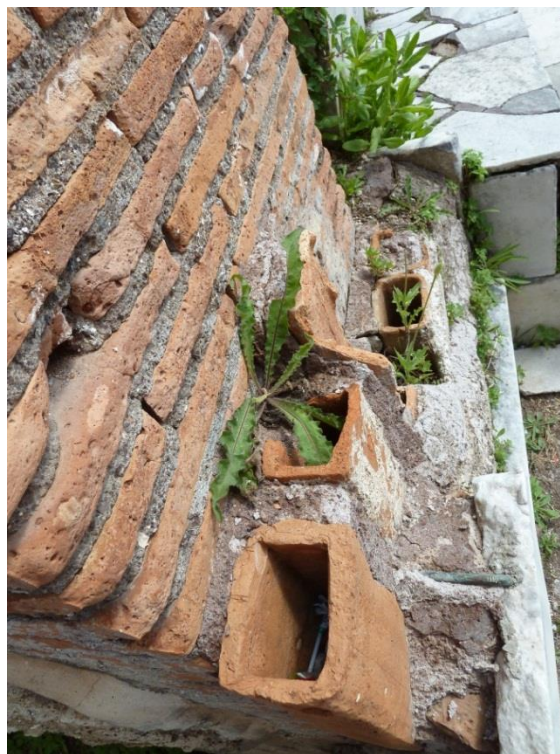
Tubuli* with Dimensions 0.12 by 0.10 meters on Wall a in Room 19
